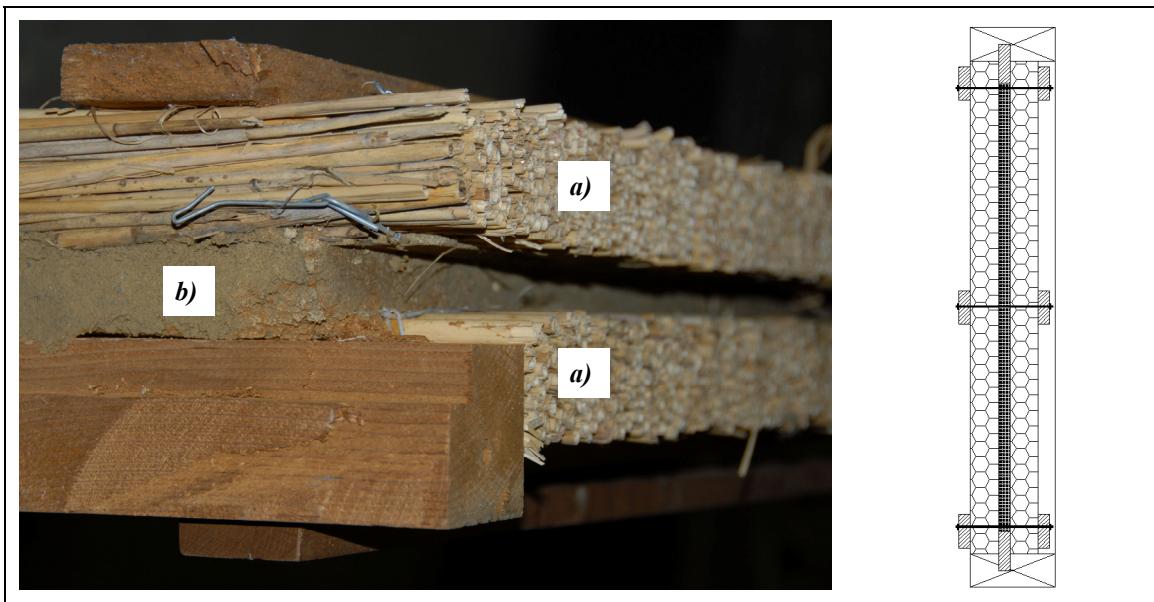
Noise barrier protection system. left: structural layers a) reed, b) clay; right: cross section
